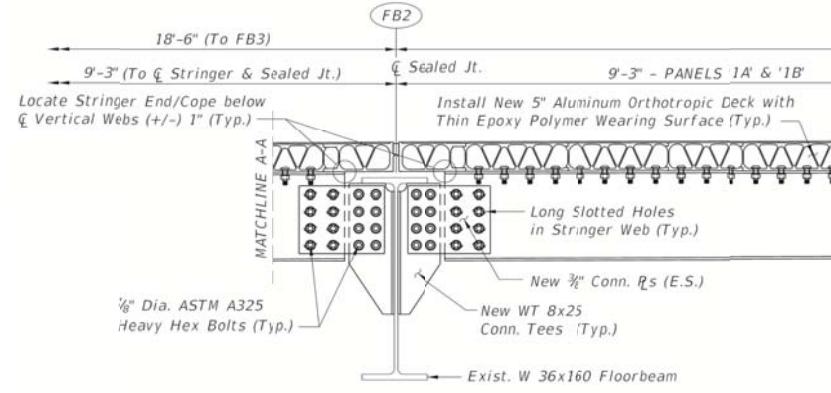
Typical Bascule Bridge Partial Longitudinal Section at Intermediate Floorbeam
